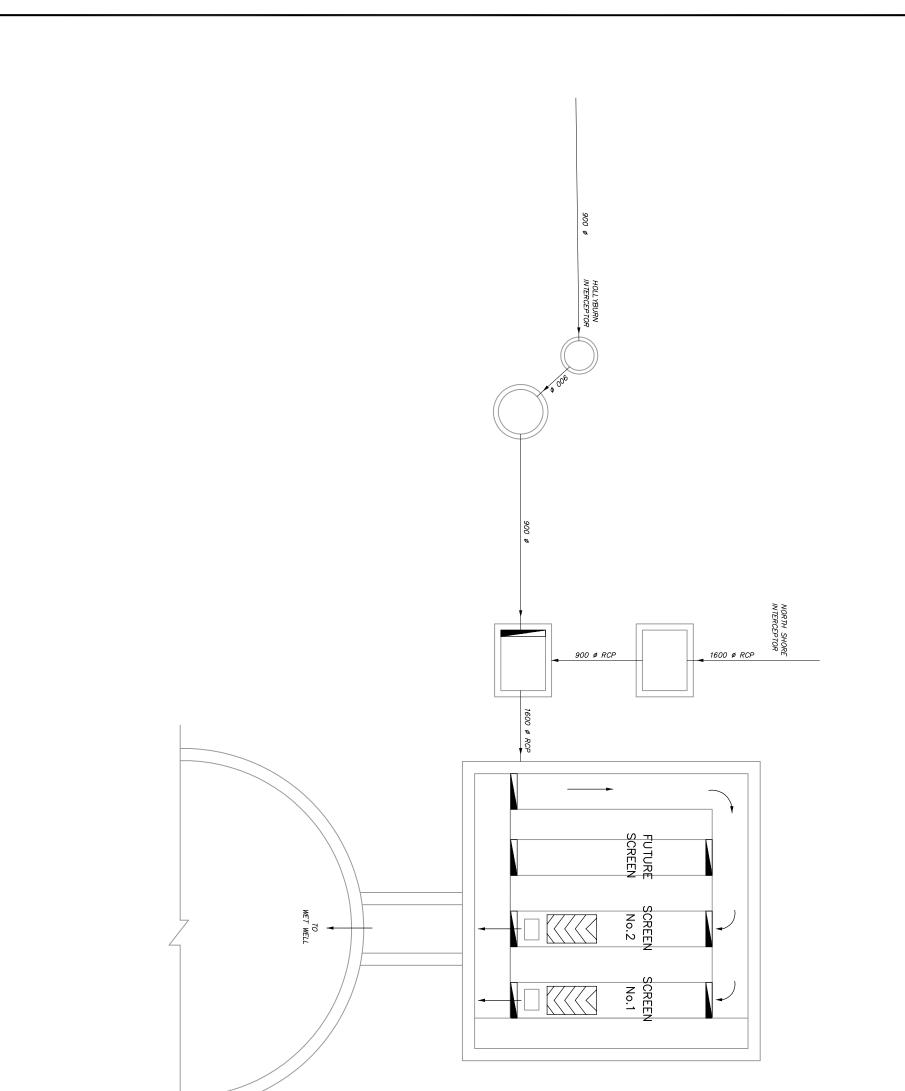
LIONS GATE WASTEWATER TREATMENT PLANT EXISTING PROCESS SCHEMATIC
